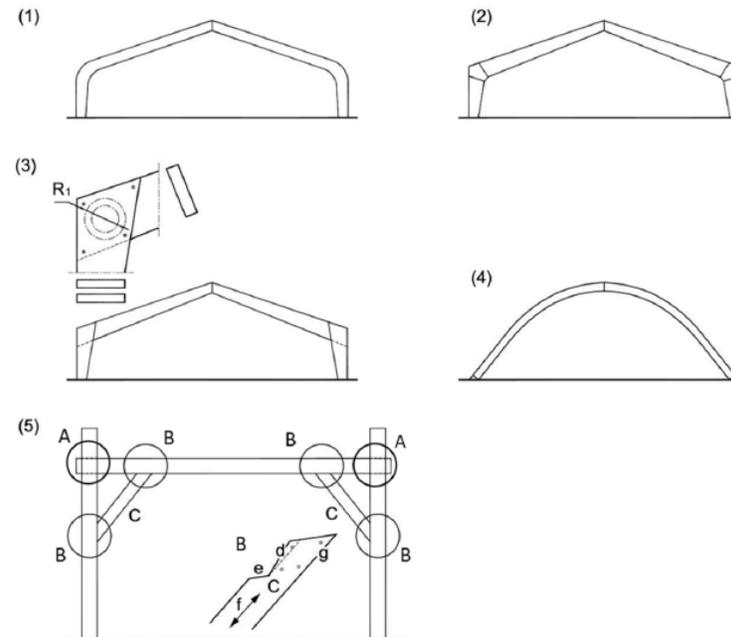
Timber frames addressed: 1) frames with relatively thin lamellas (glued), 2) finger joint (glued) connections, 3) dowelled connections, 4) arches, 5) traditional frames
